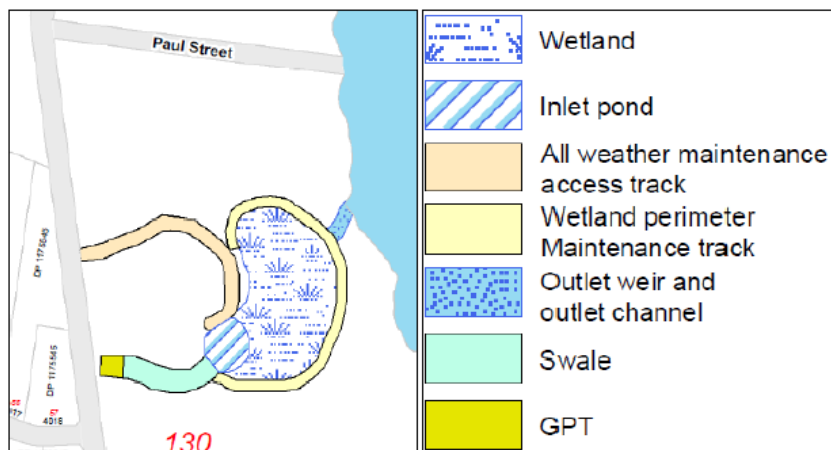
Indicative location of proposed stormwater infrastructure on 130 Hall Street, Pitt Town
